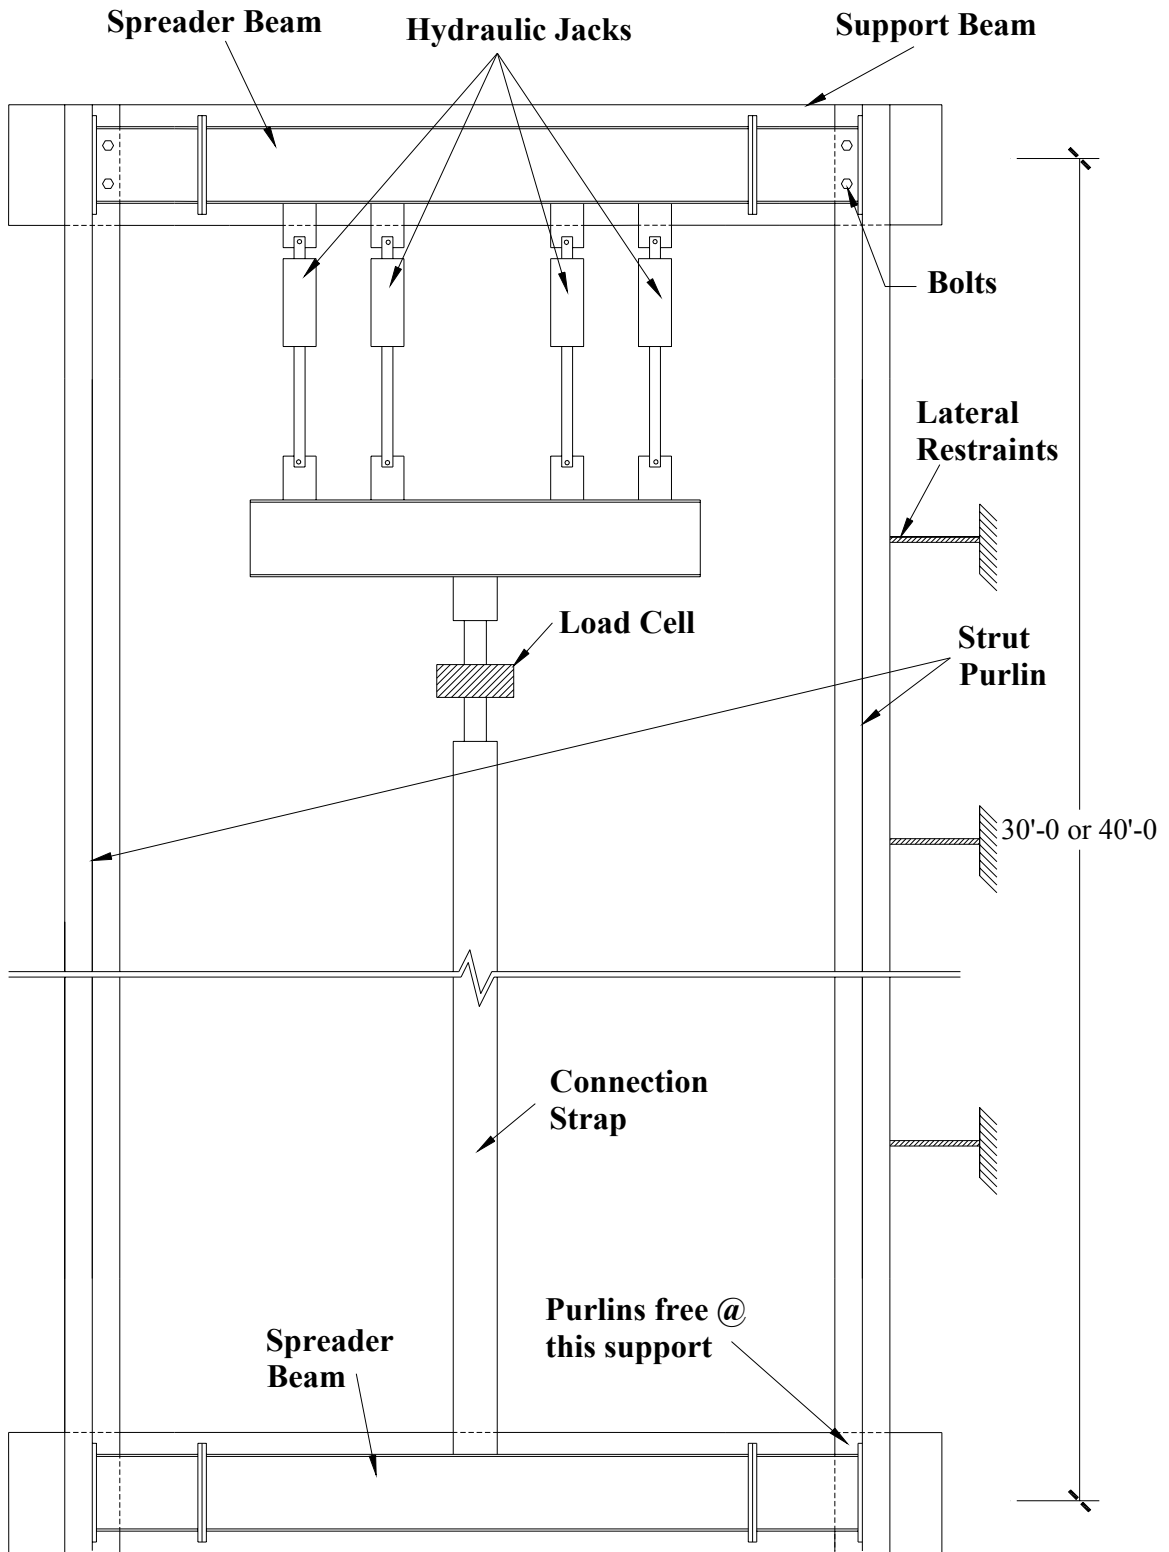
Plan View of Test Setup (2 Purlin w/ Lateral Restraint)
